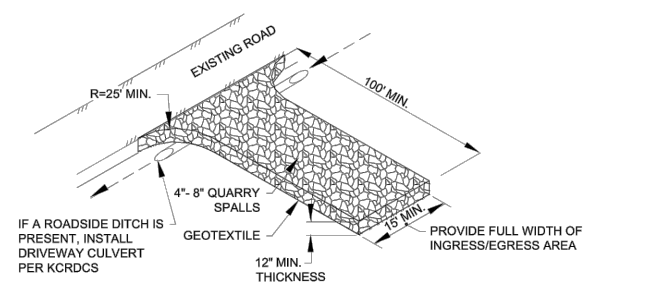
A STABILIZED CONSTRUCTION ENTRANCE
